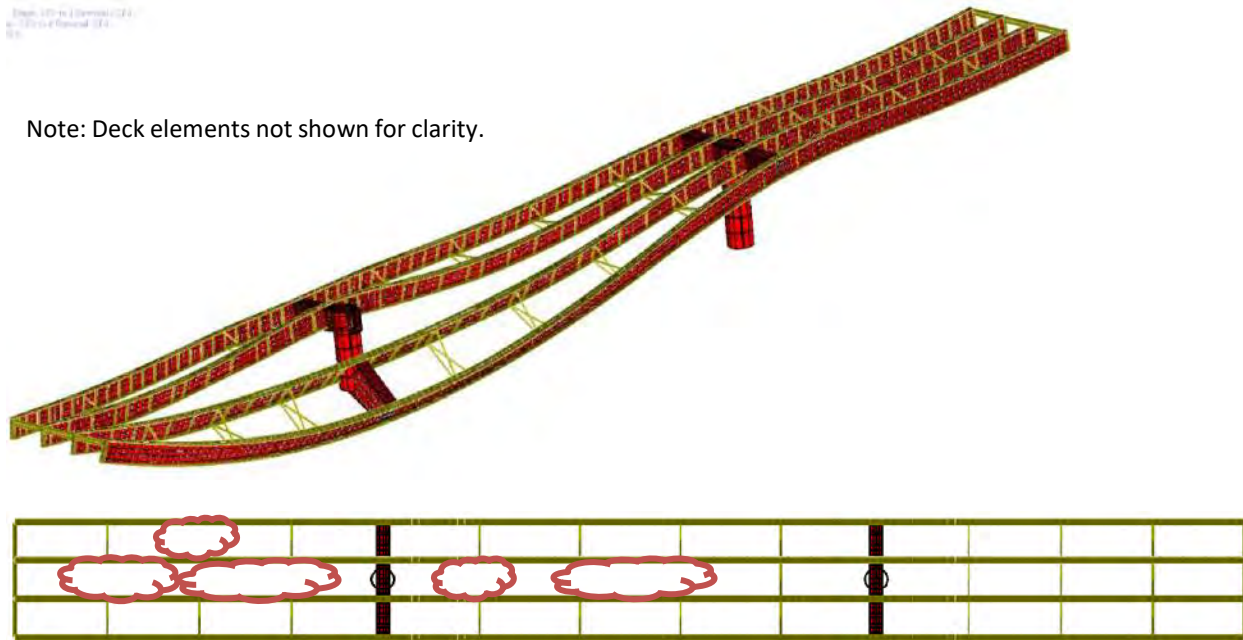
Location of Fracture in Damaged Condition at Integral Pier Cap Between Girder B and C
